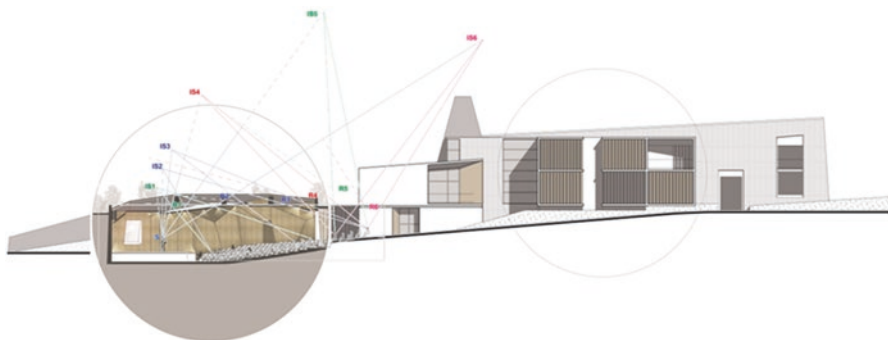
West Elevation – Section diagram of the auditorium reflector design based on the image source method
